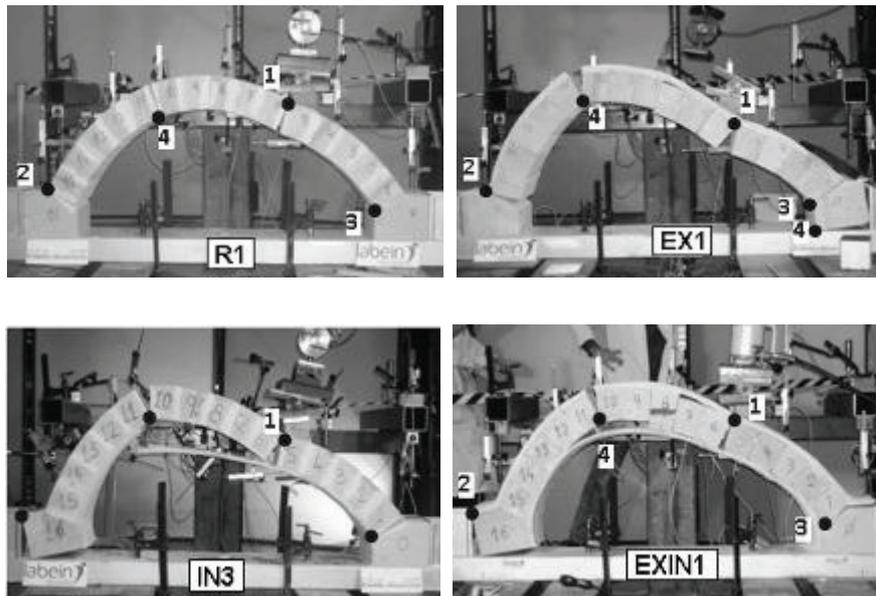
Failure modes and hinge position according to different strengthening lay-outs.
